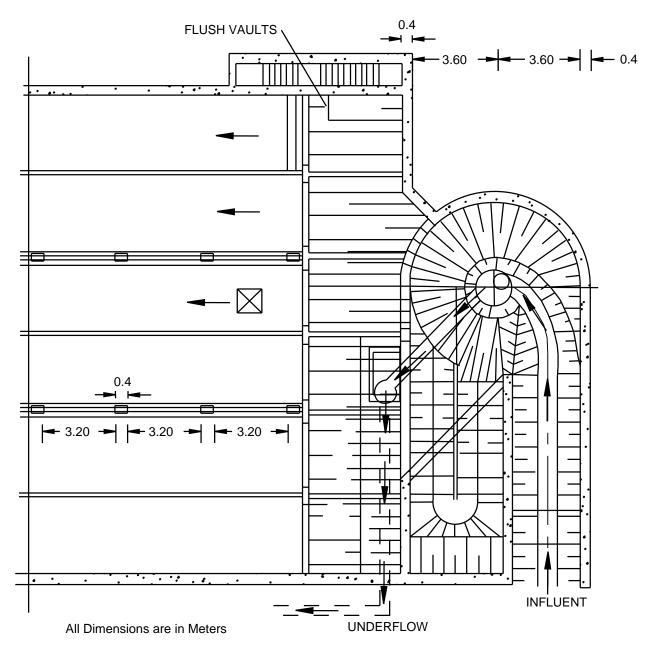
Stadt-Essen - Plan View, Tank Influent
